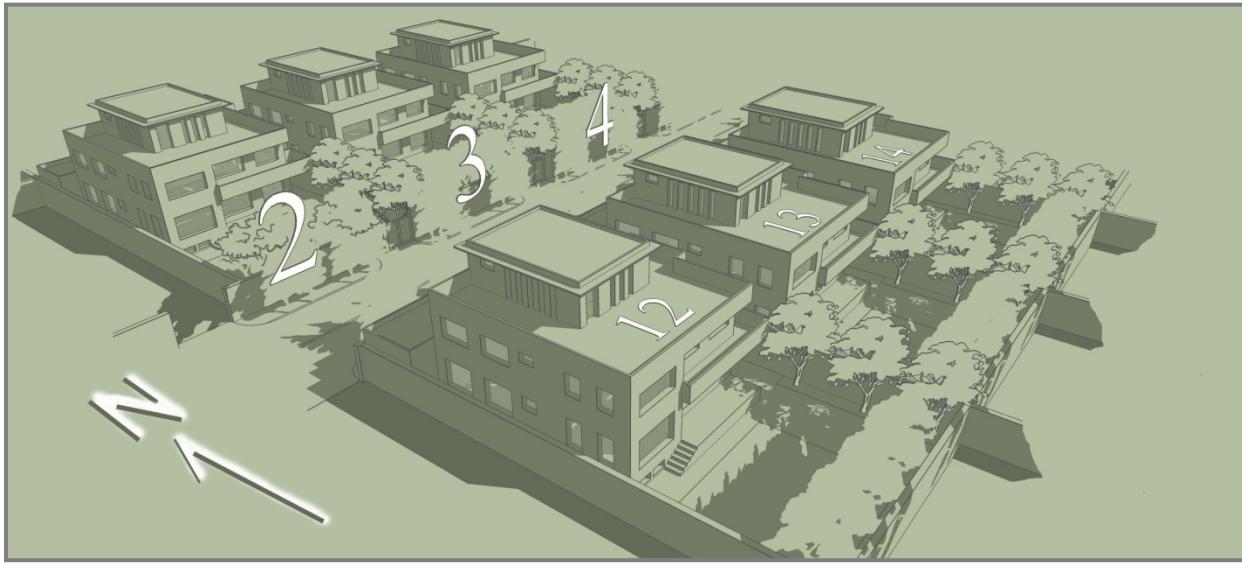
House 13, based on KM plot subdivisions is located between house 12 and house 14. (Drafted by the author)
